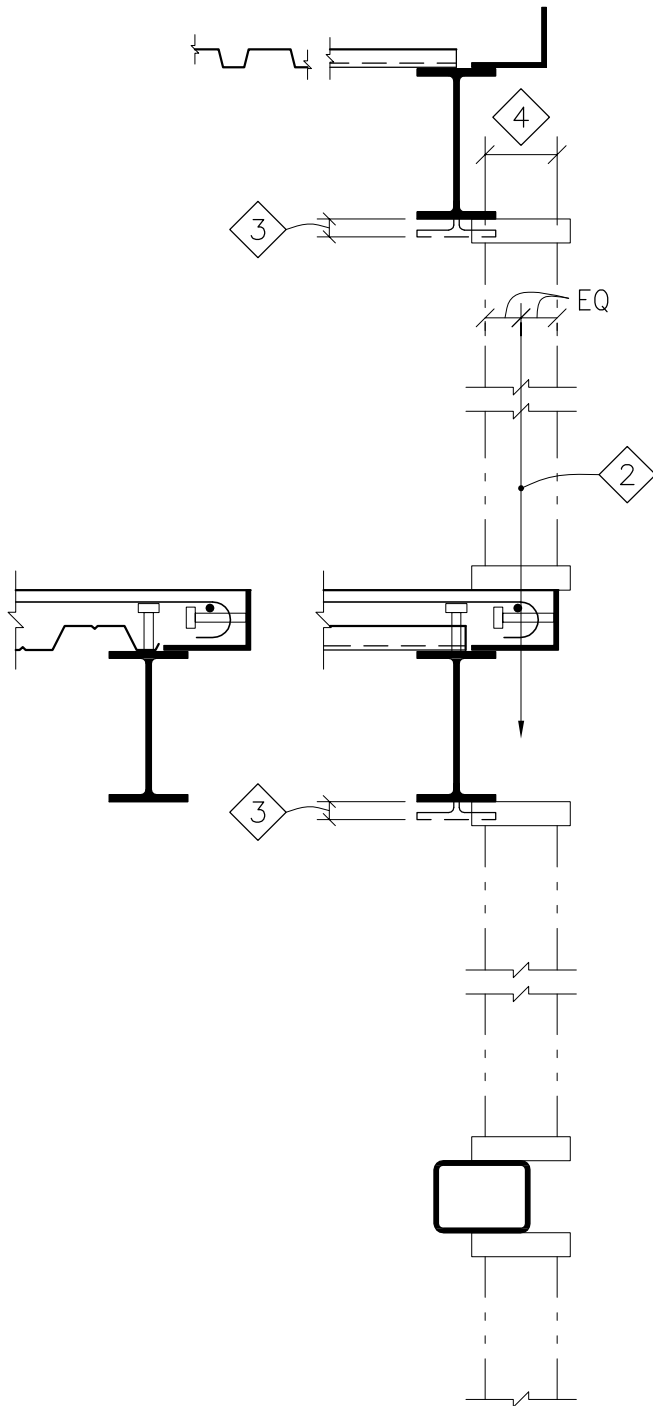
CURTAIN WALL ENGINEERING ISSUES
